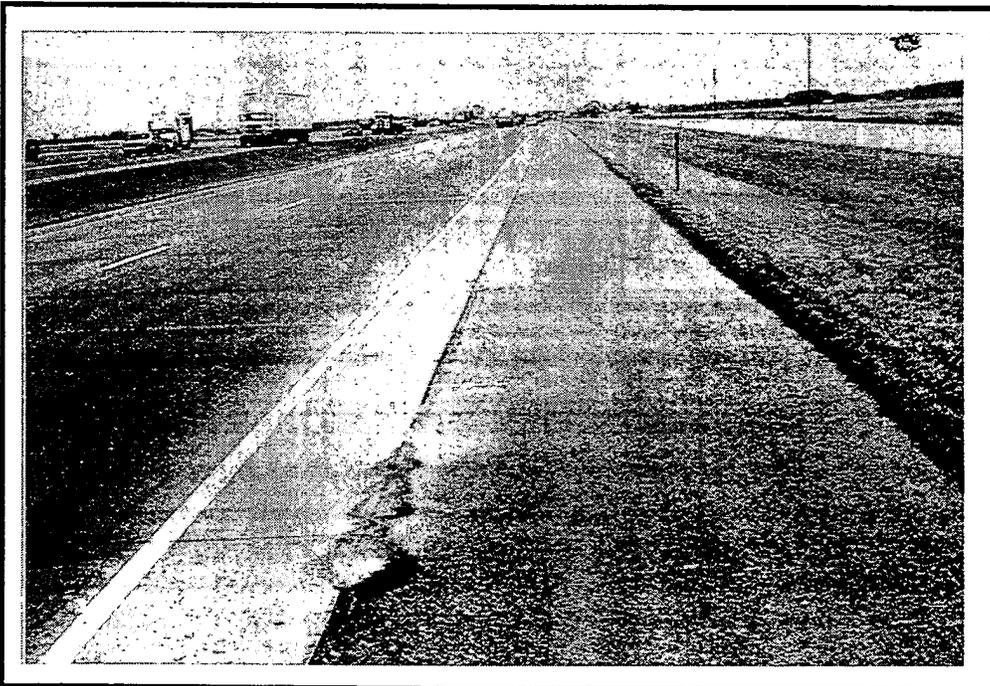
Pumping in Jointed Concrete Pavement, Low Severity
